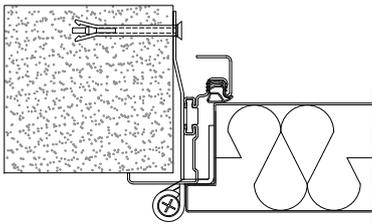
Installation of an opening frame with a thermal break using steel plates (optional)
